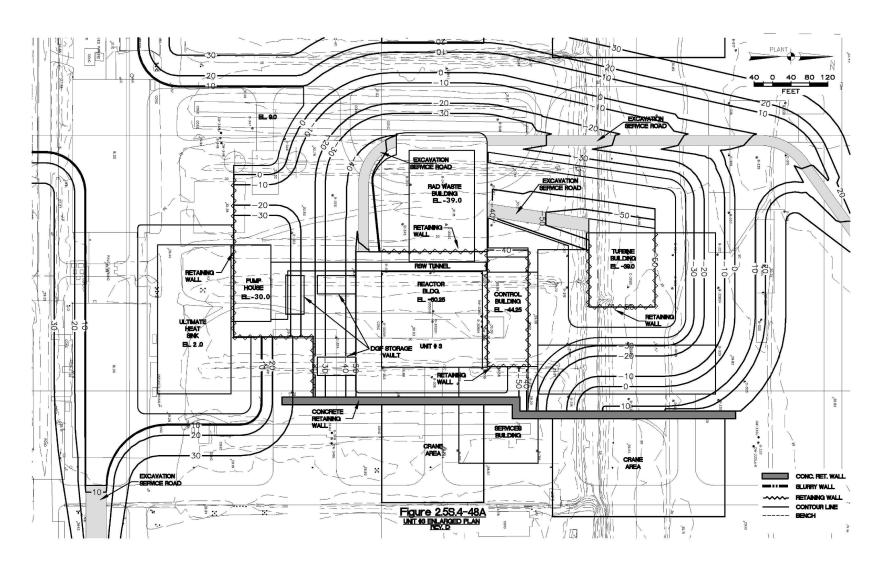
S.4-48A Unit #3 Enlarged Plan Rev. D
